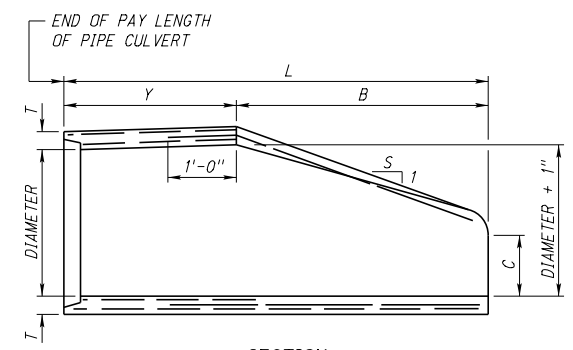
DETAILS OF CONCRETE FLARED END SECTION (FOR REINFORCED CONCRETE PIPE-ARCH)
